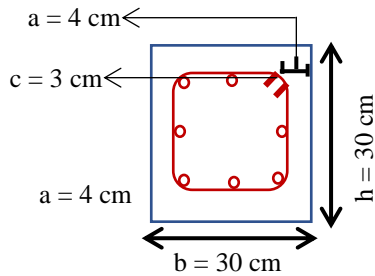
Cross section of reinforcement in column k1 reinforcement
